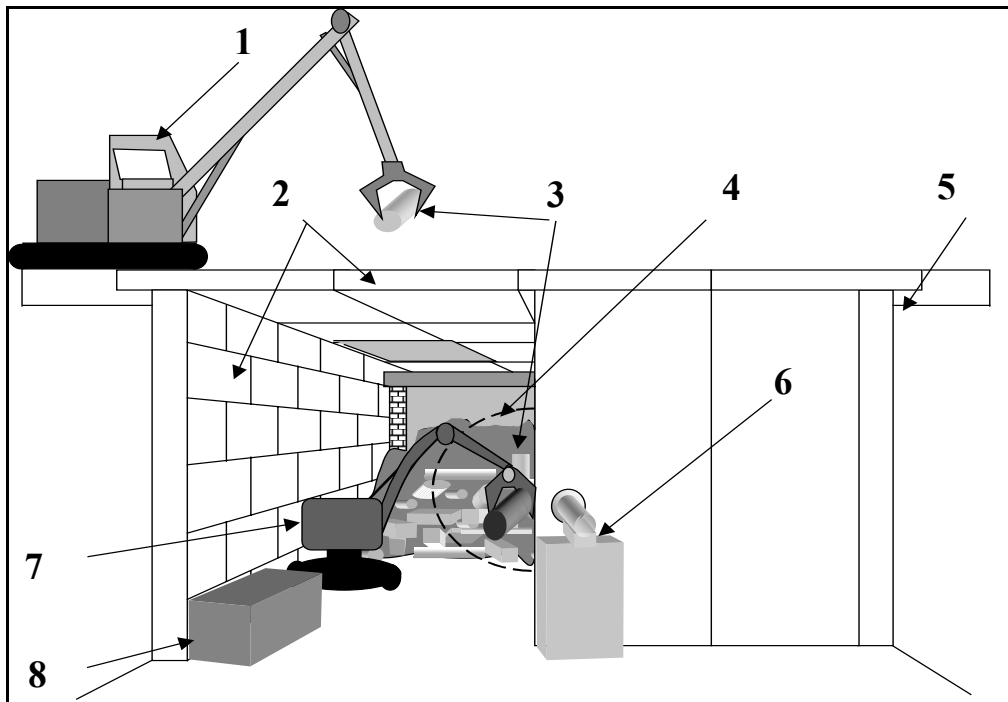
Schematic of the radwaste repository. 1 – excavator used for radwaste extraction from the repository, 2 – additional shielding structure of concrete blocks with the ceiling of concrete plates, 3 – radwaste prepared for loading into containers, 4 – field of view of the gamma imager, 5 – ground level, 6 – gamma imager mounted on the stand at the repository entrance, 7 – radio-controlled BROKK robot, 8 – reinforced container for high-level radwaste.
